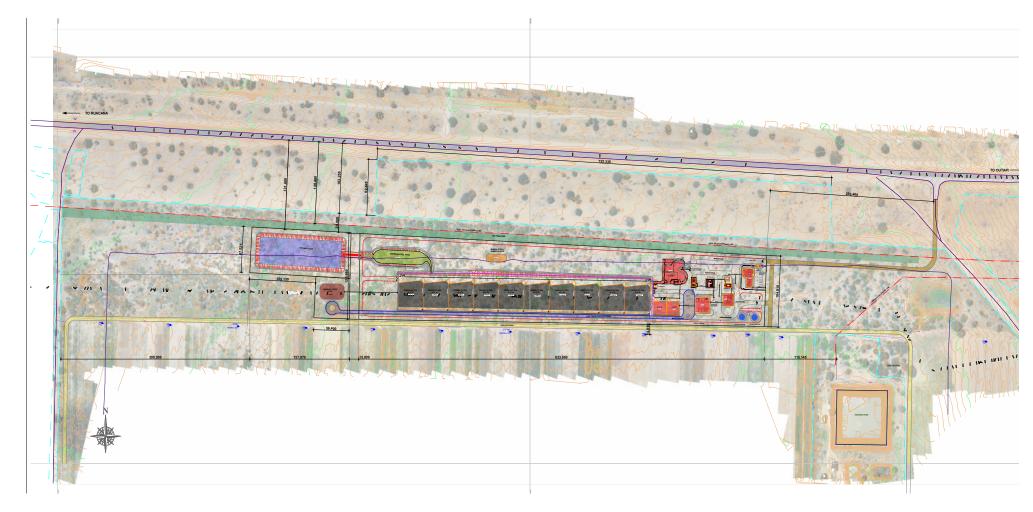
Feedlot layout plan (Source: Dunamis Consulting Engineers)
